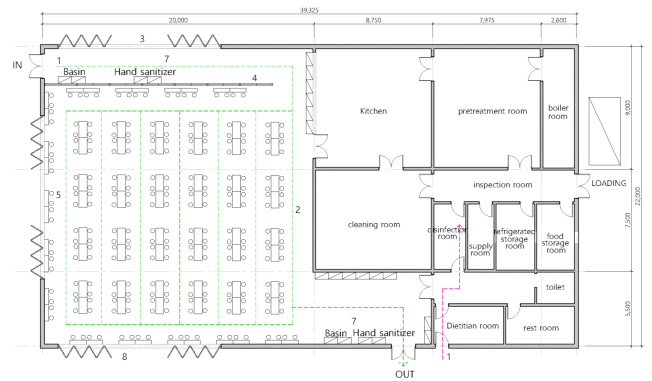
School cafeteria plan under the infectious disease situation (unit: mm)
